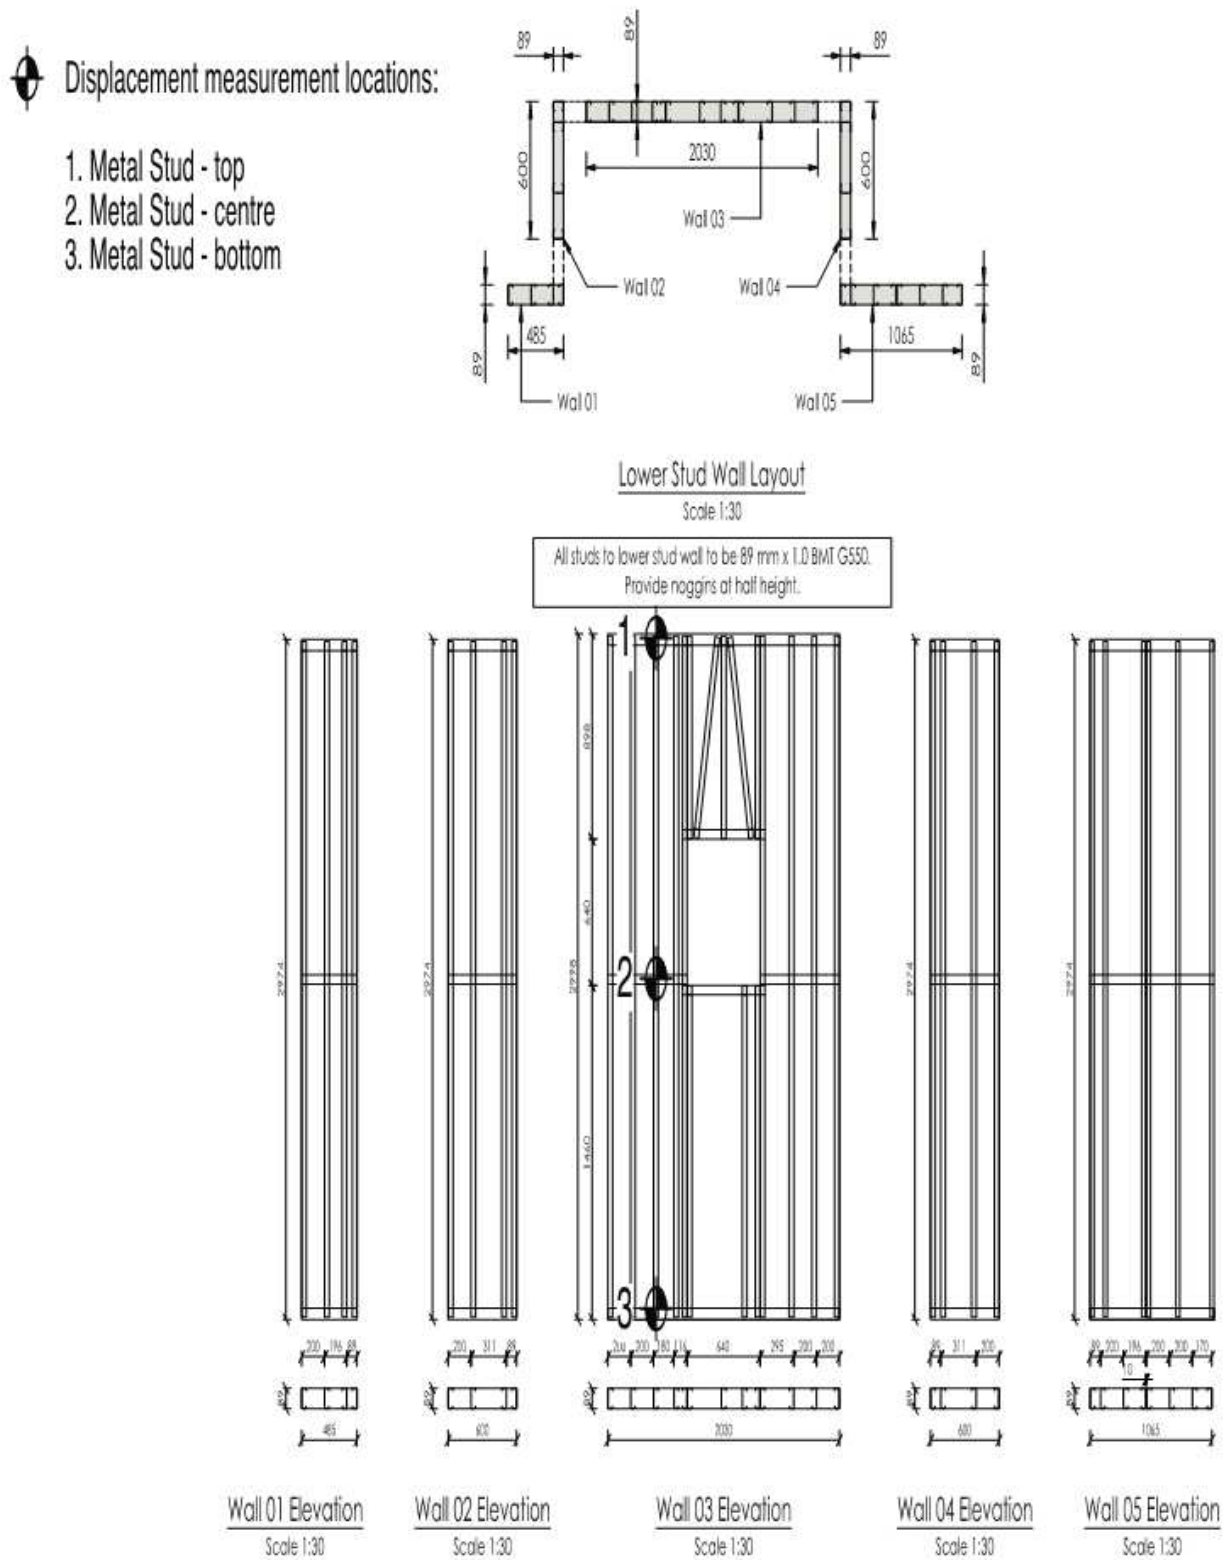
Elevation of the stud frame indicating the structural measurement locations
